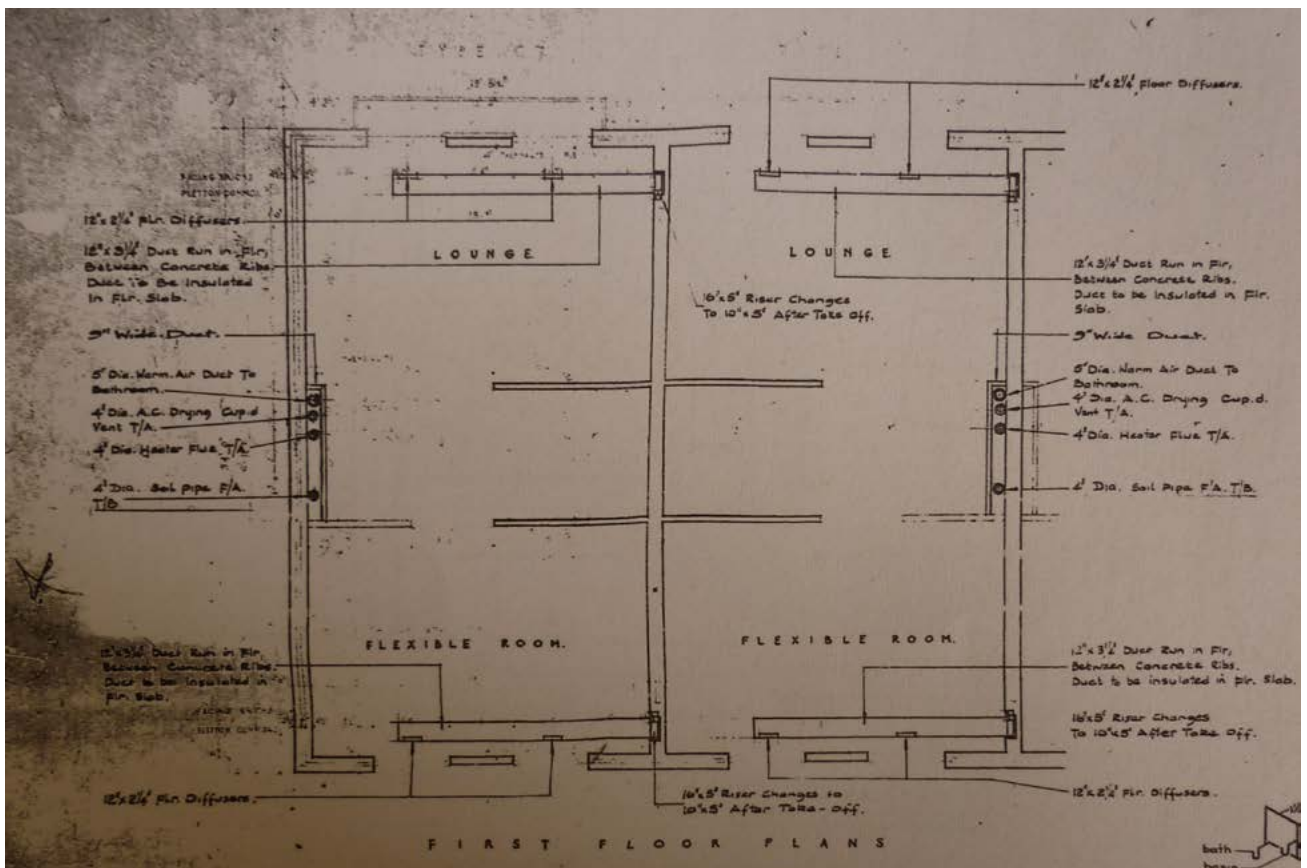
Plans of House Types C for Phase I and II. 1966. Camden Local Archive
